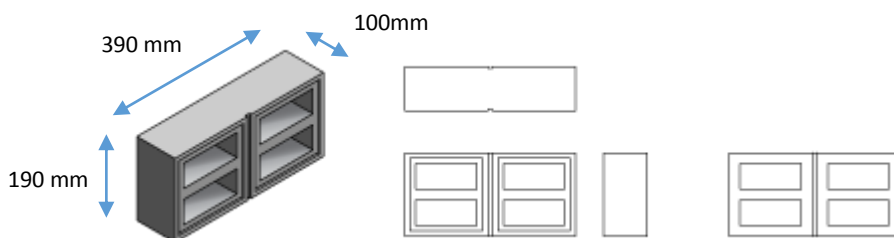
Type C concrete vent blocks at PJ Trace Centre
